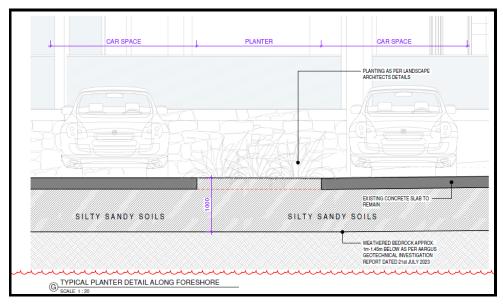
Amended Foreshore Planter (Source: Innovate, Revision F)
